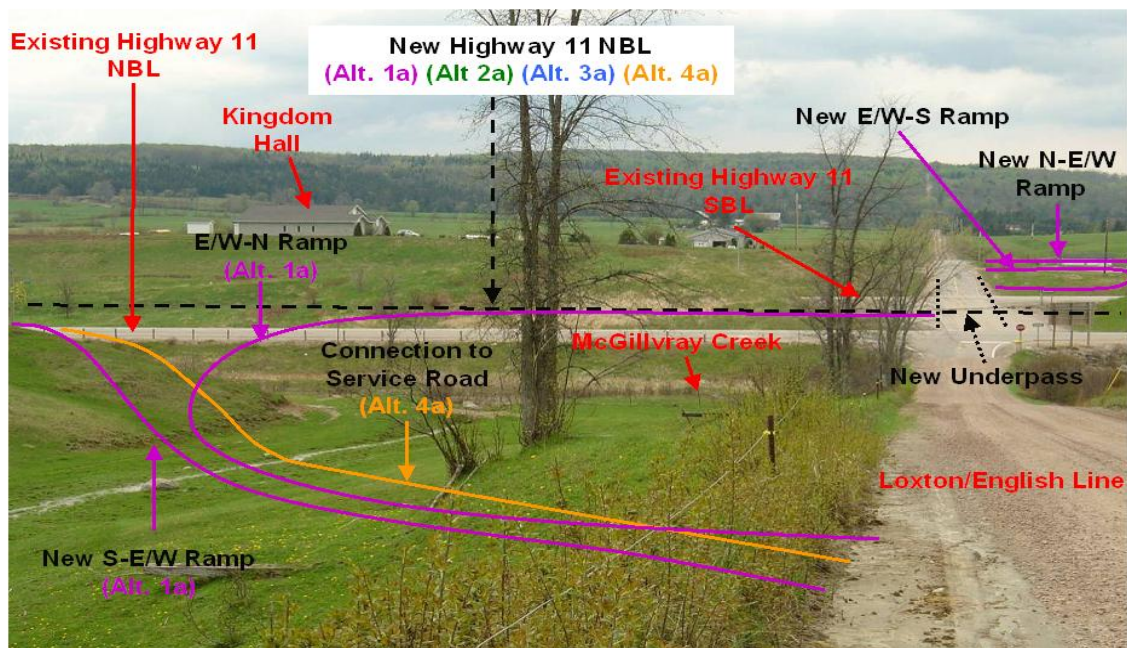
View looking northeast from south side of Loxton Line at 30 m east of Highway 11 NBL with the McGillvray Creek and the sand and gravel pit in view. (May 8, 2007)
